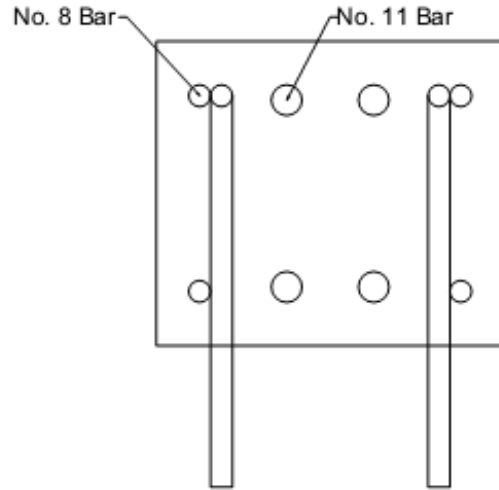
Longitudinal column reinforcement-4 No. 8 bars + 4 No. 11 bars. Transverse reinforcement not shown. Not included in current analysis.
